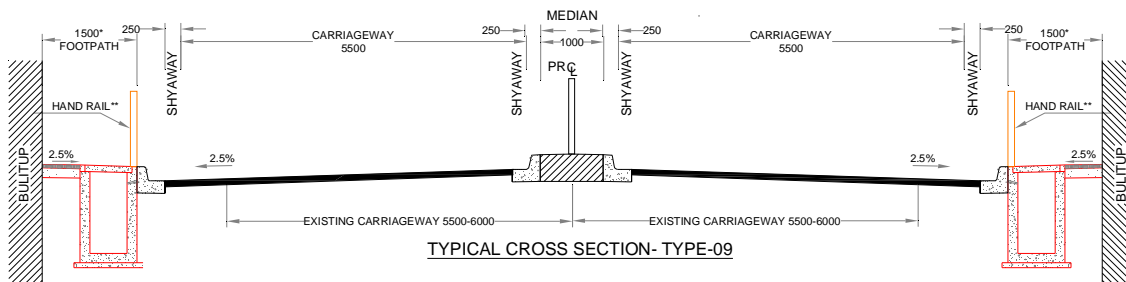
TYPICAL CROSS SECTION- TYPE-9
